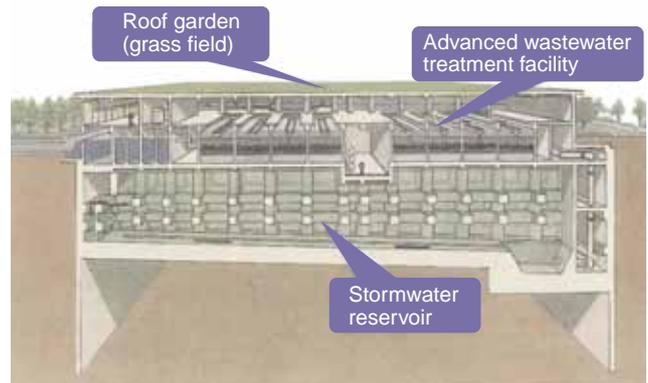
Stormwater reservoir at Hirano Sewage Treatment Plant
